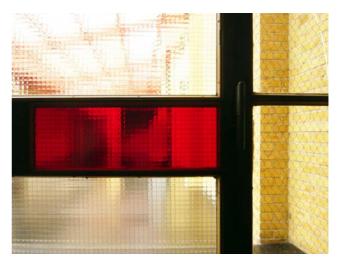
Coloured reinforced glass on door from the student dormitories to the glass corridor in the ADGB Trade Union School, photo 2009, Brenne Architekten
